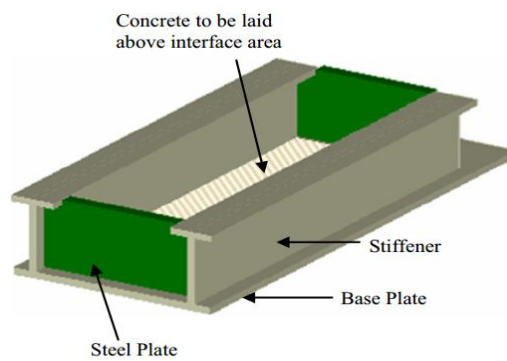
FRP Formwork with Bond Coating (*Goyal et al. (2016)*)
